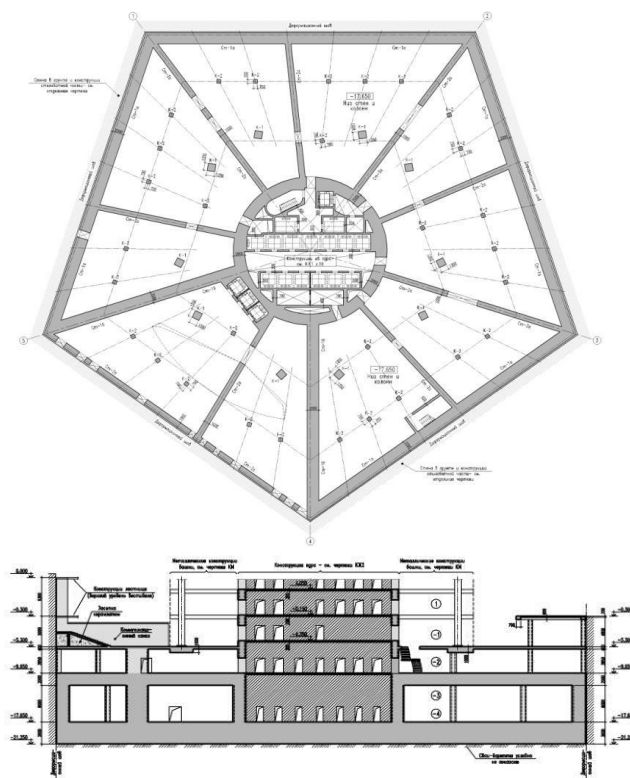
Layout and cross-section of the box-shape pile raft. The tower foundation was designed with respect to the state of the art concept of utilizing piles of varying length (Figures 1, 3). This ensures the stiffness of the pile foundation enough to sustain excessive loads transmitted by a rigid central core of the superstructure.
